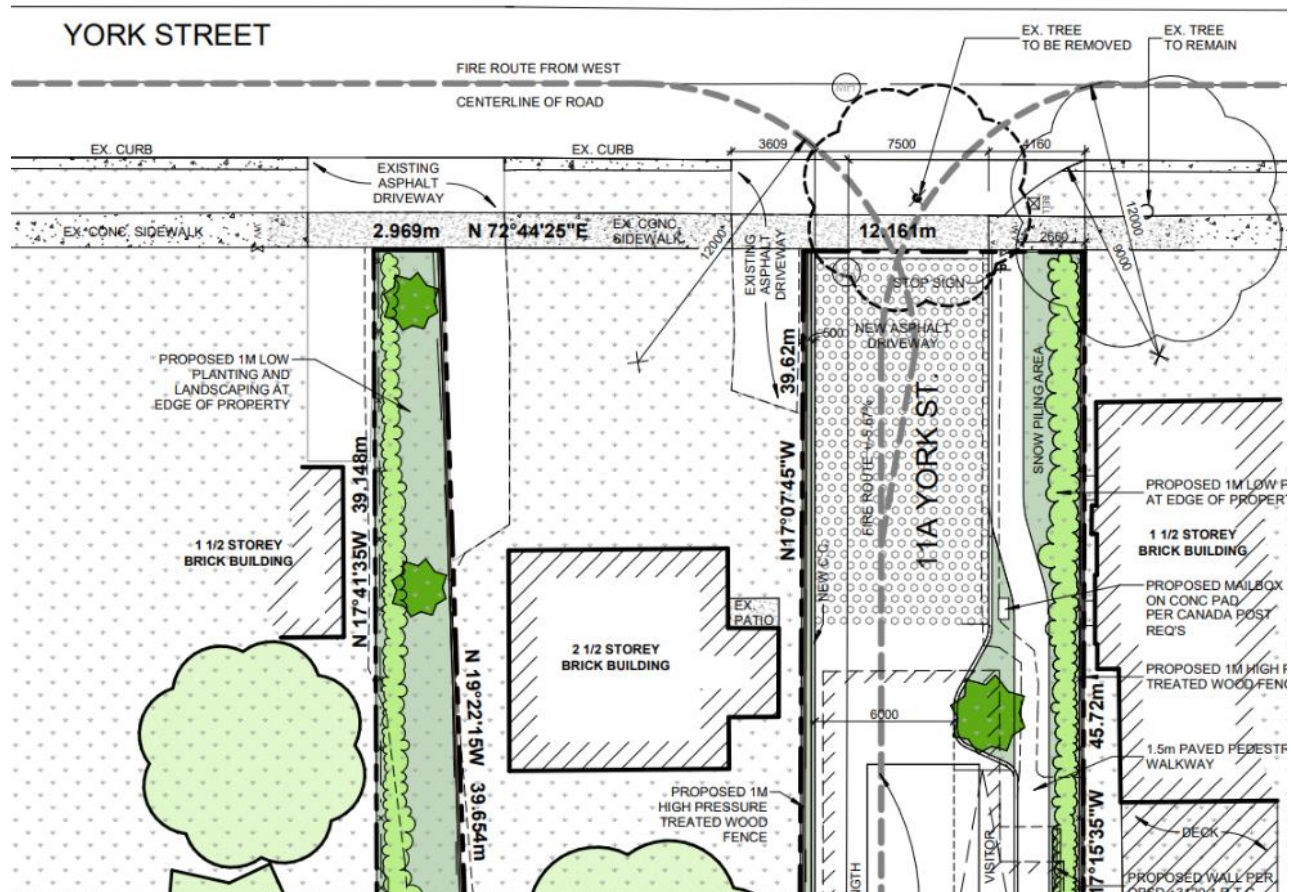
Excerpt from Landscape Plan showing updated plantings and mail-box area
